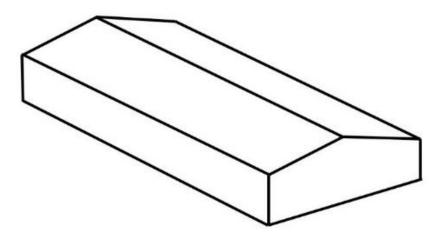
Author's model depicting the shape of a typical steel portal framed livestock building. Author's own photo.
